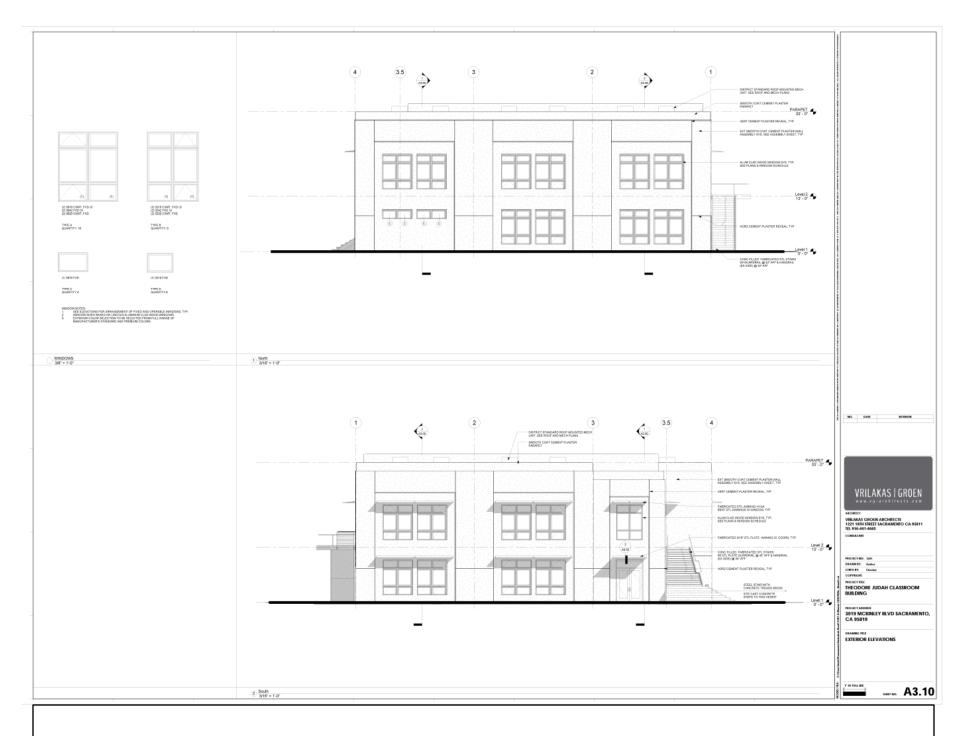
FRONT AND REAR BUILDING ELEVATIONS
